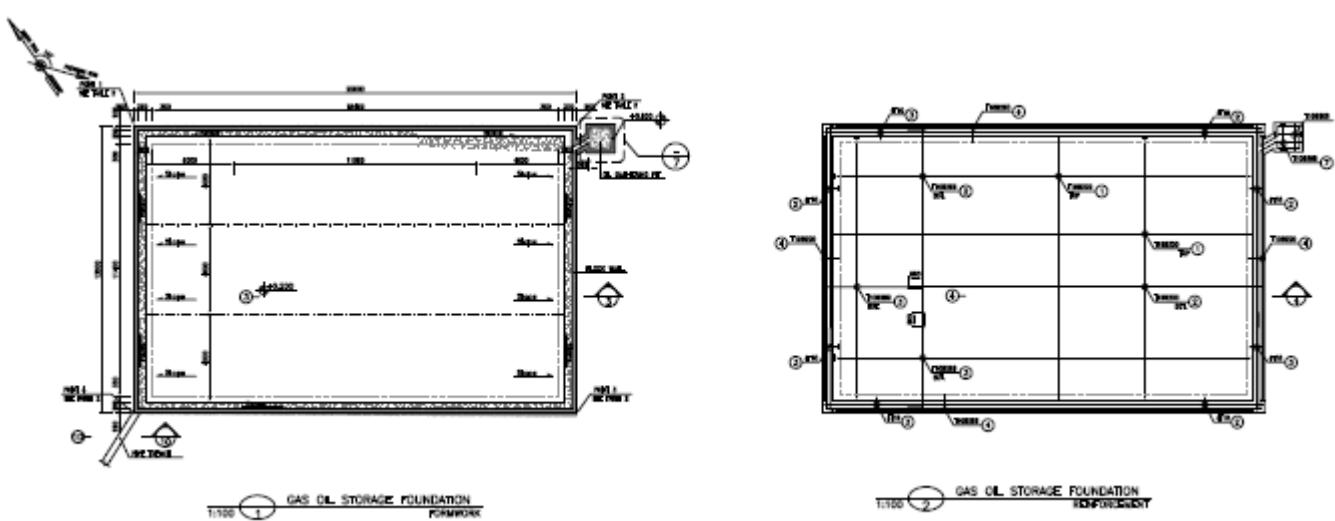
Gas Oil Storage Foundation (20mx12mx0.2m)
